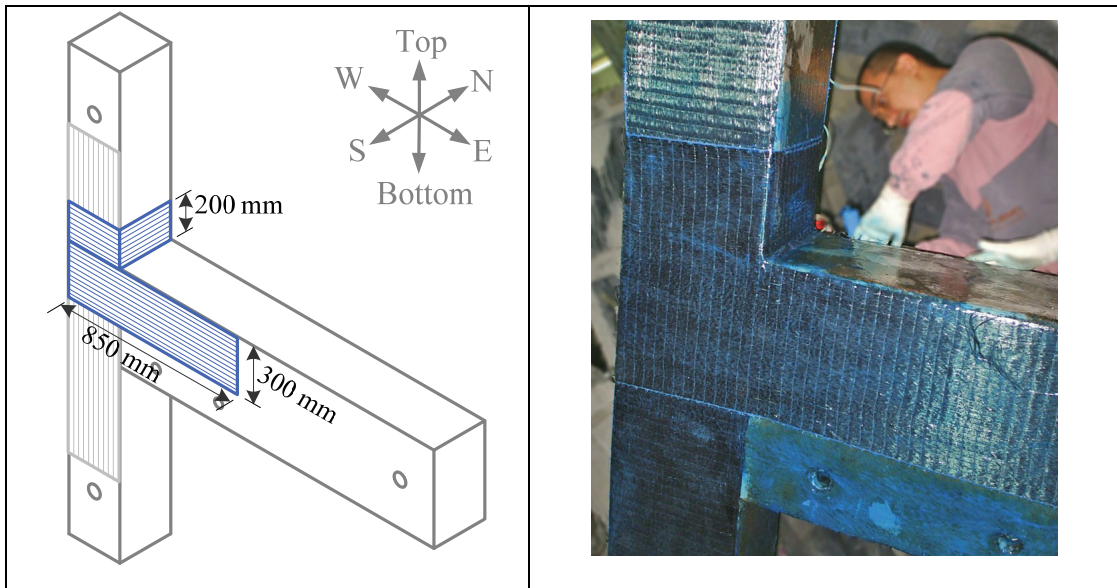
U-shaped CFRP applied to the top portion of the joint, step (iii)
